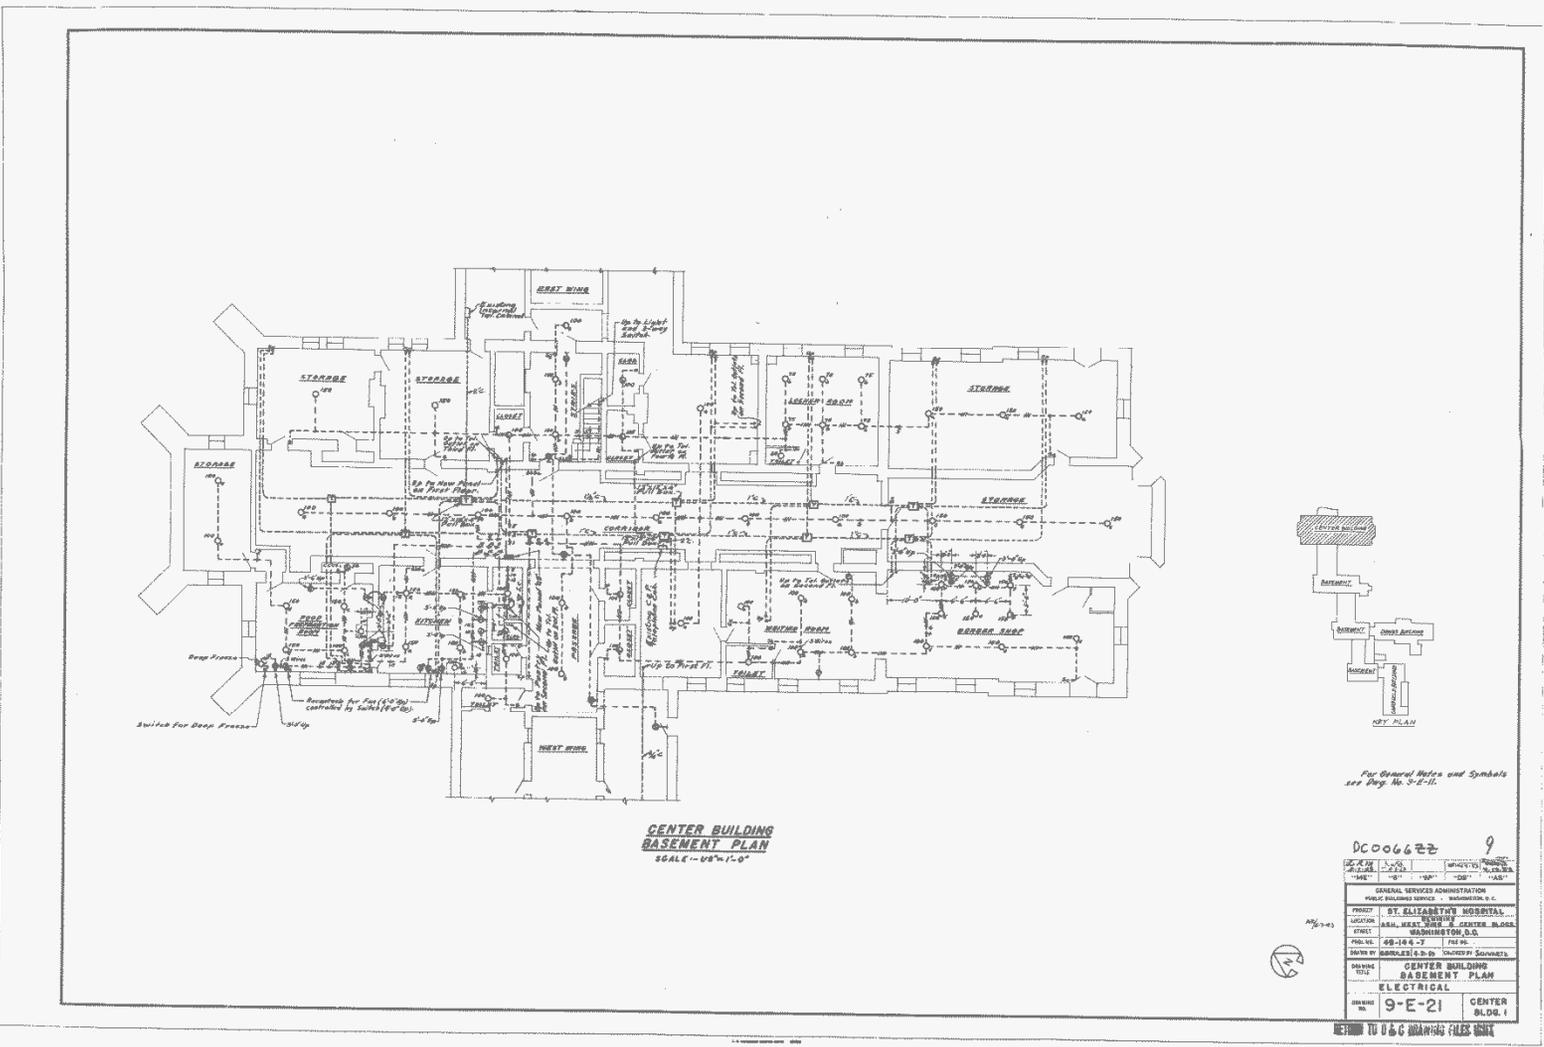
Basement plan of the Center Building outlining improvements to the electrical system, 1953. Source: GSA archives, image DC0066SE0009.
